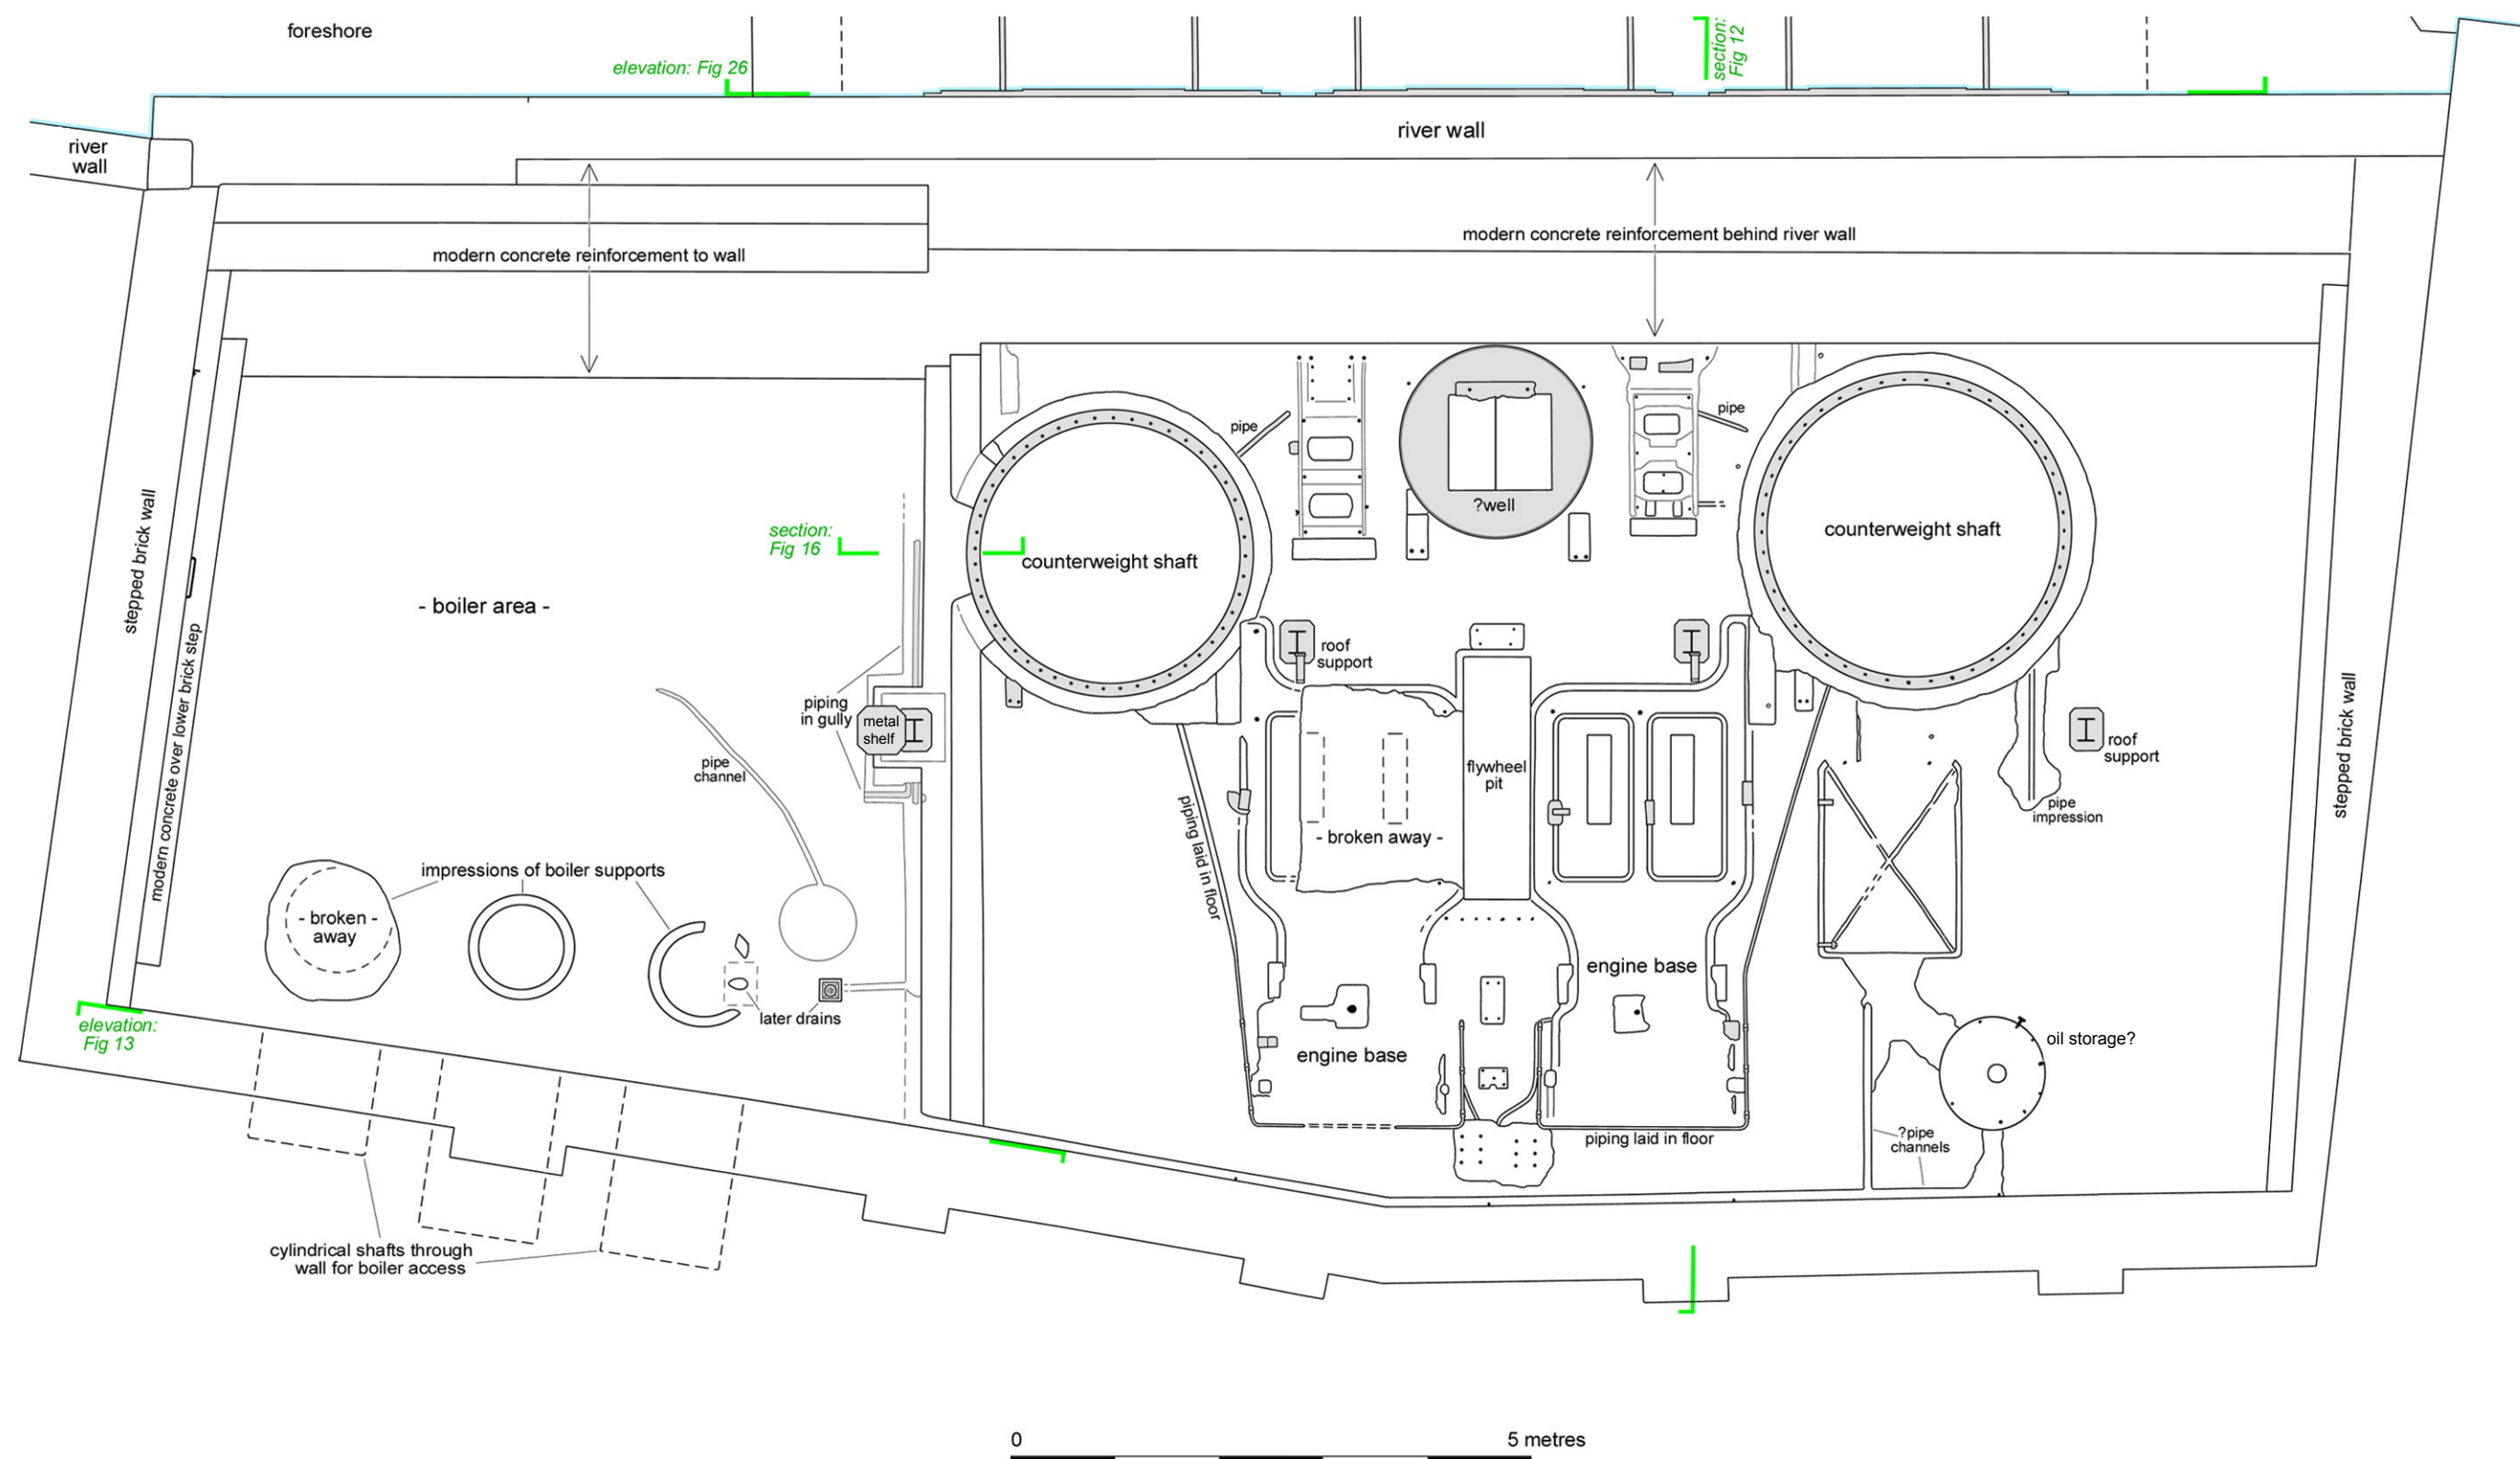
Floor plan of the Steam Ferry Engine Room, also showing location of sections and elevations. Metal features are shown in greyscale
